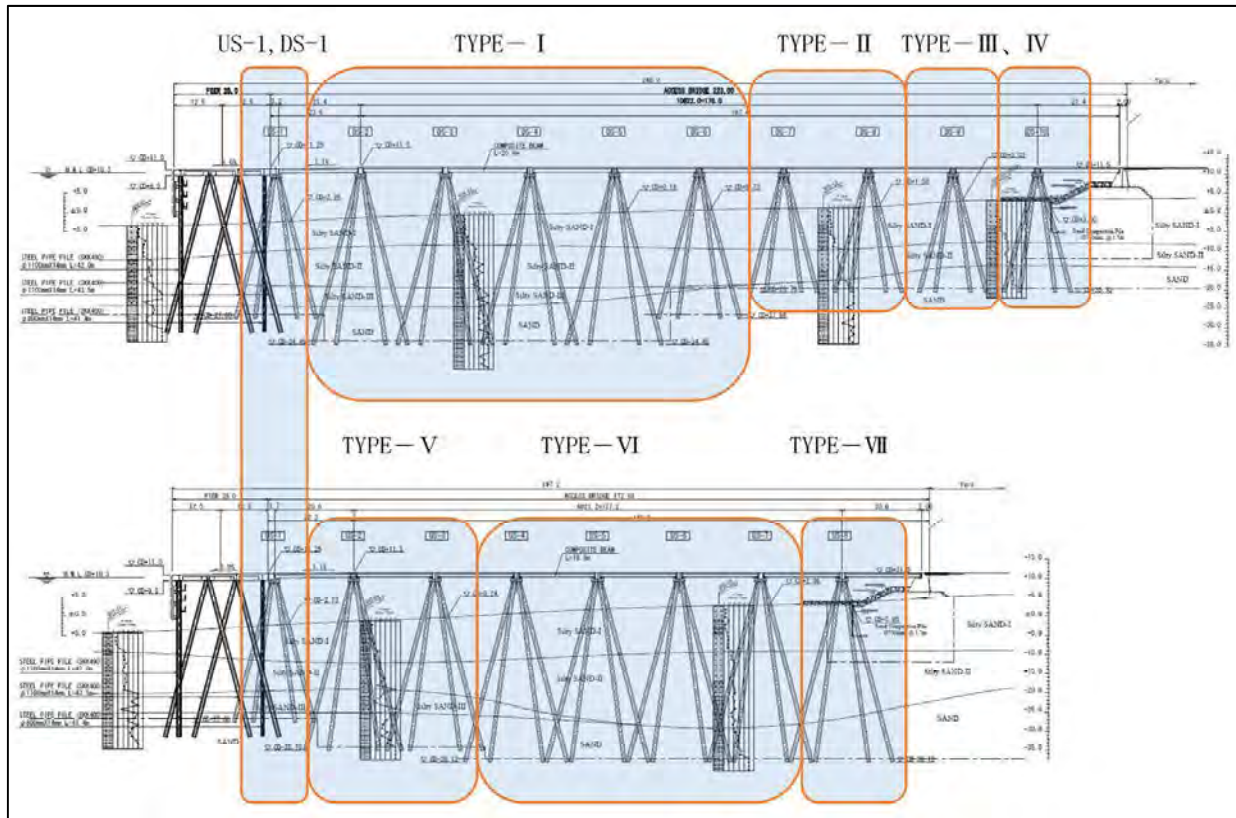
Section Divisions of Pile Bents of Access Bridges
